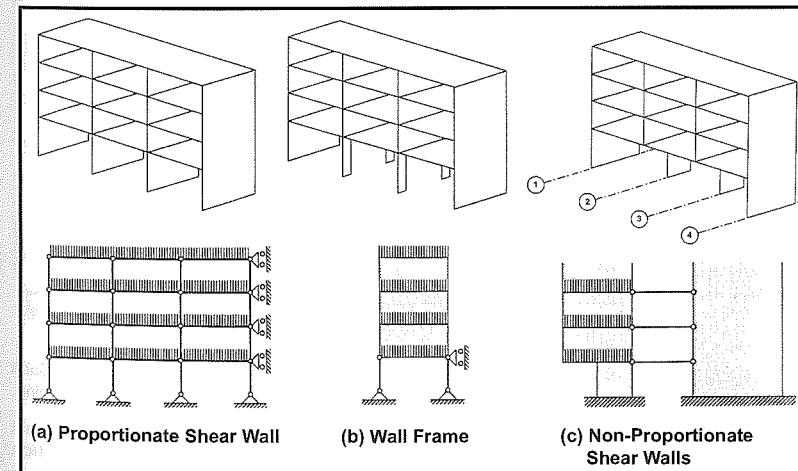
Statical Models For Vertical And Horizontal Load Distribution Of Large Panel Structures
